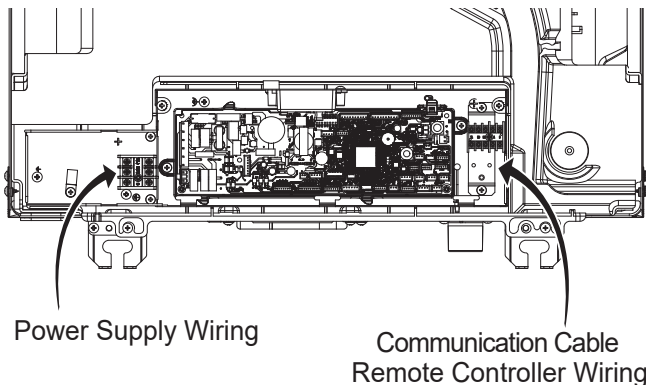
TS Frame Two-Way Cassette Wiring / Cable Routing, Side View.
